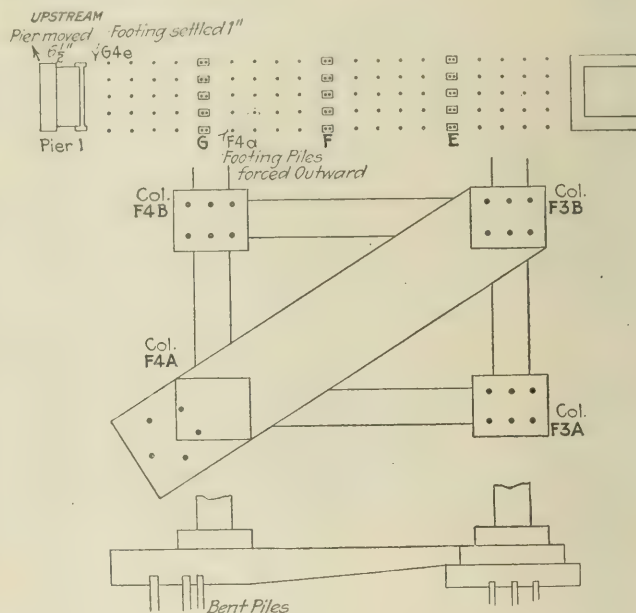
SKETCH OF RECONSTRUCTED ARCADE COLUMN FOOTING
